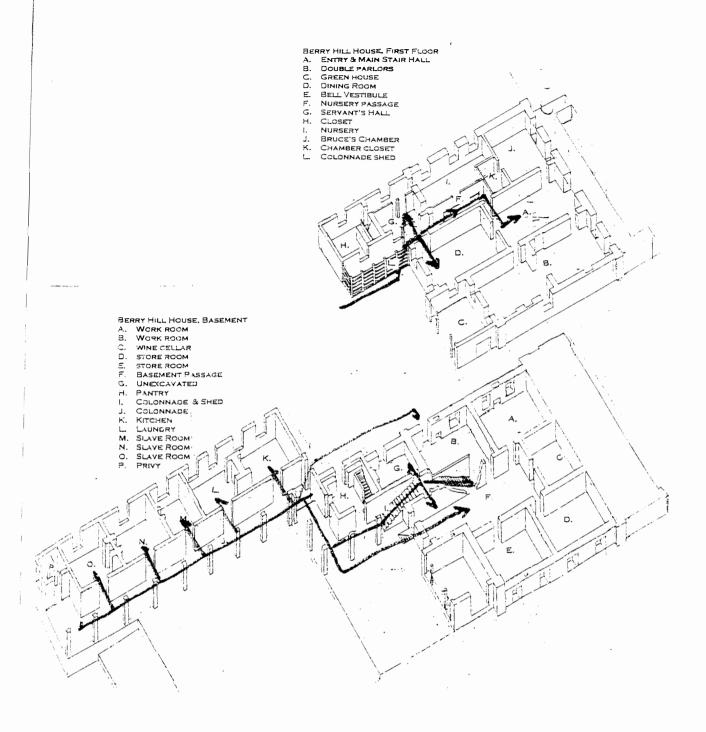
Berry Hill House. Axonometric showing slave circulation.
